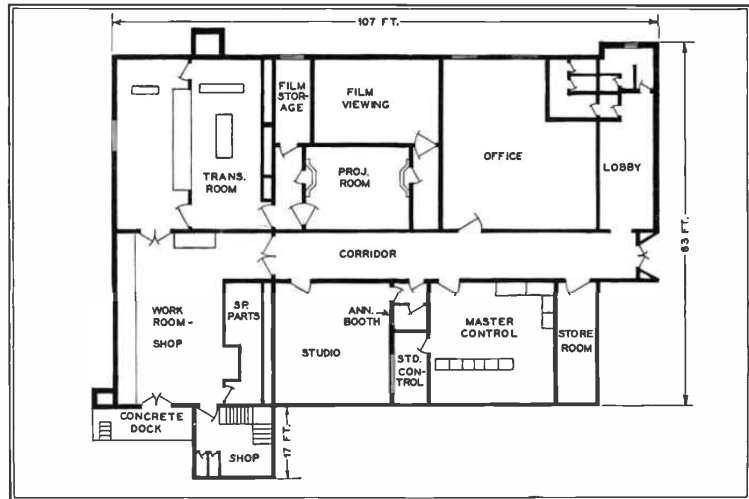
THIS ONE-FLOOR BUILDING HOUSES ALL WDAF-TV FACILITIES, INCLUDING A LIVE STUDIO
